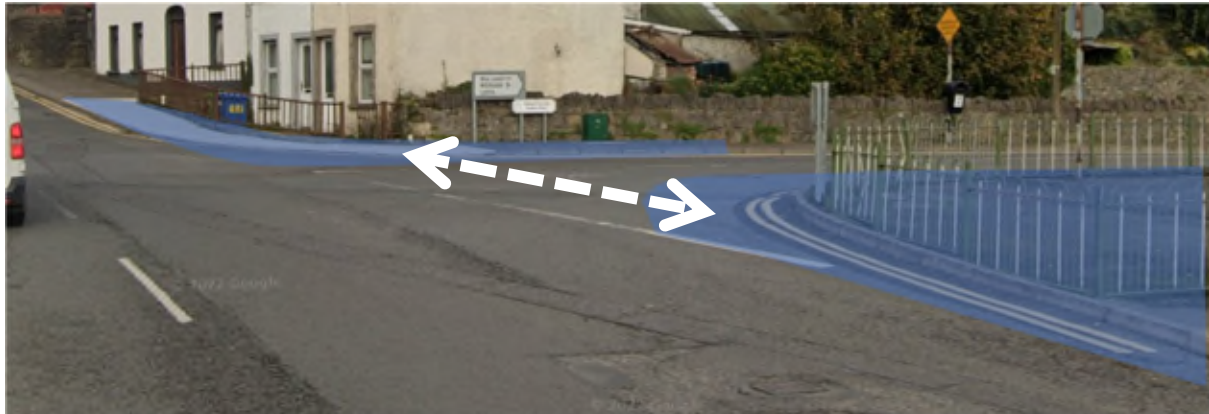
Absence of crossing facilities at Roslea Road / Church Hill Junction
